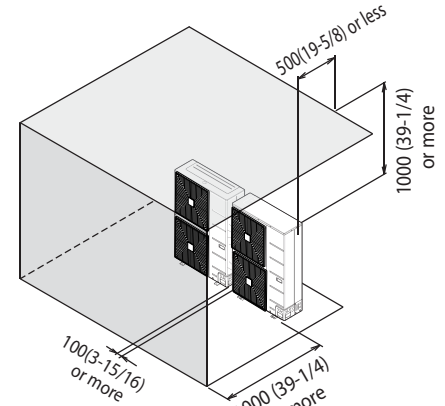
Single Row Units—high rear wall and low front wall with no side walls or overhang
